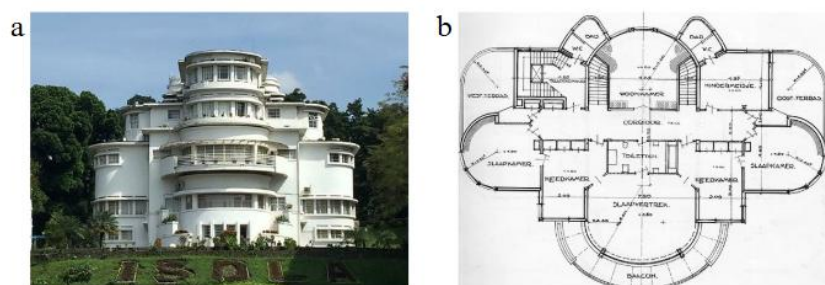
(a) Villa Isola Exterior; (b) Villa Isola Floor Plan
